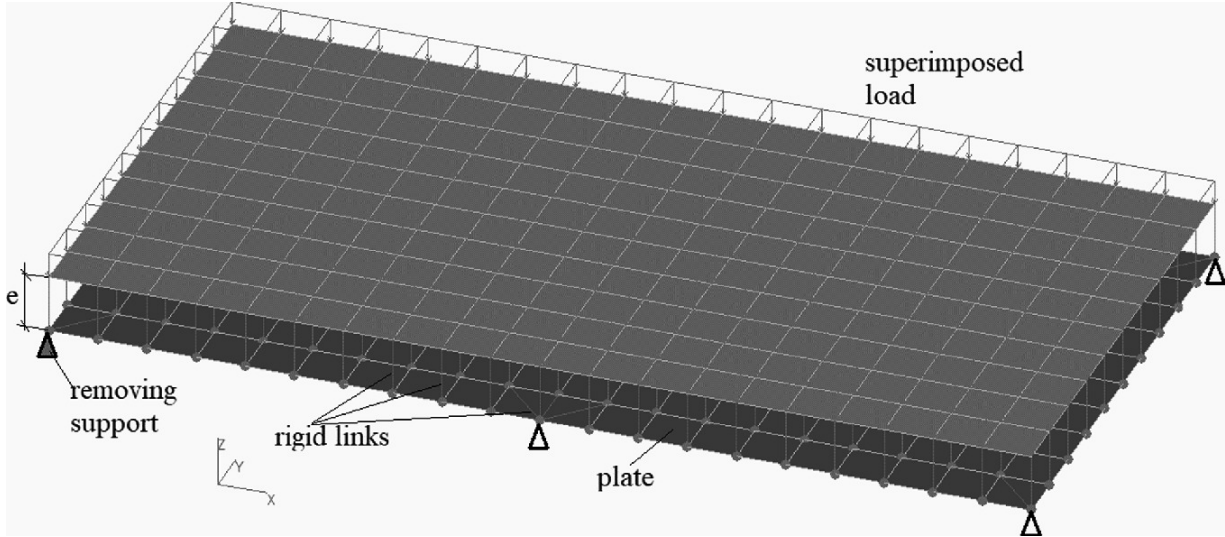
Reinforced concrete slab with suddenly removed corner support
